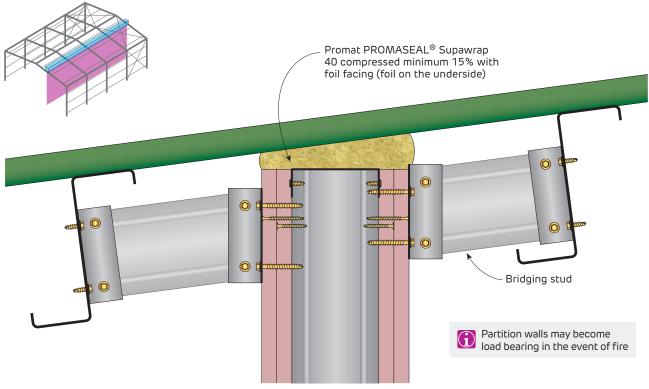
Partition Wall to Roof - Parallel to Purlins Up to FRL 120/120/120 Section
